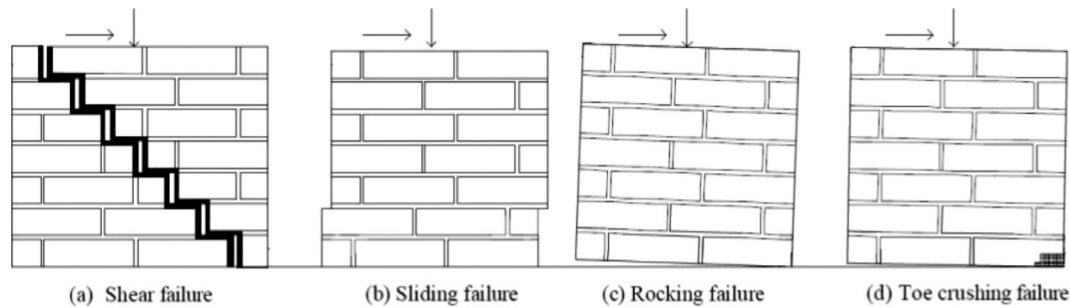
In-plane failure mechanisms of un-strengthened brick walls.
